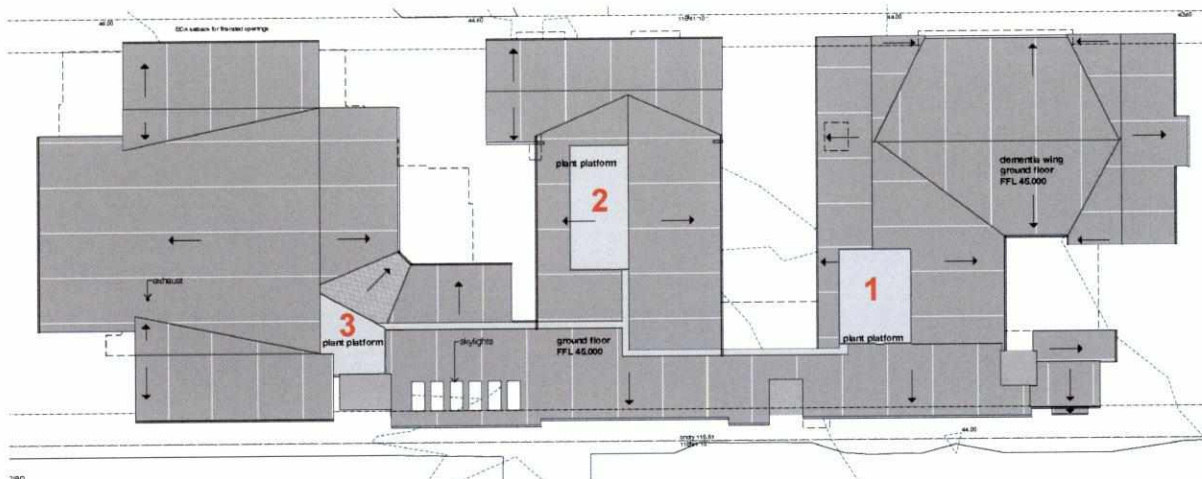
Proposed plan of the rooftop indicating the 3 locations for plant and equipment (Plan Ref 0102).
